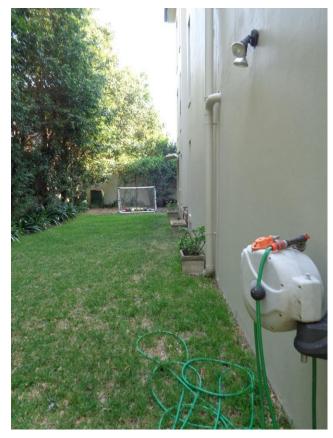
Site viewed from western elevation, showing area subject to the proposed extension.
